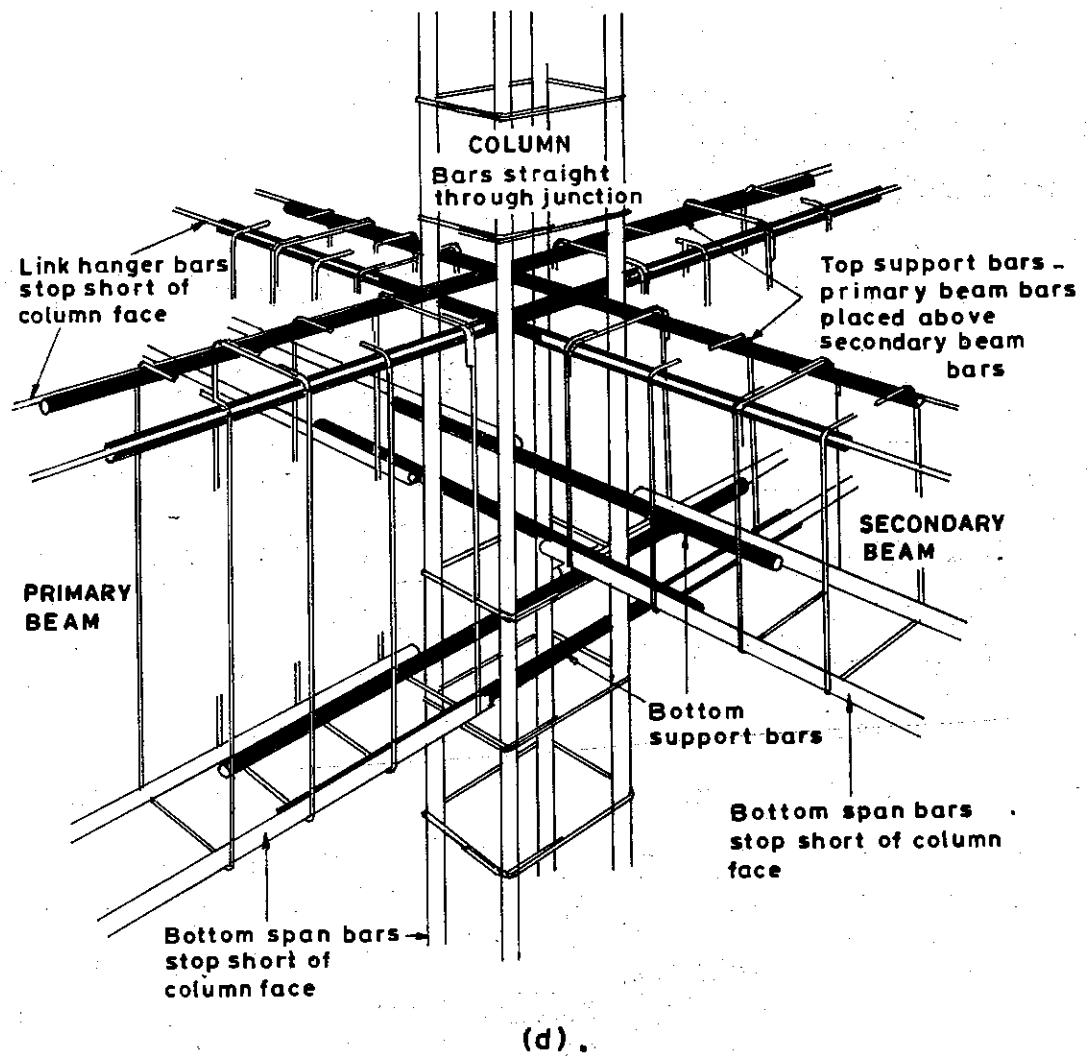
Details of reinforcement at column junctions: (d) Detail of beam-column junction at internal column.
